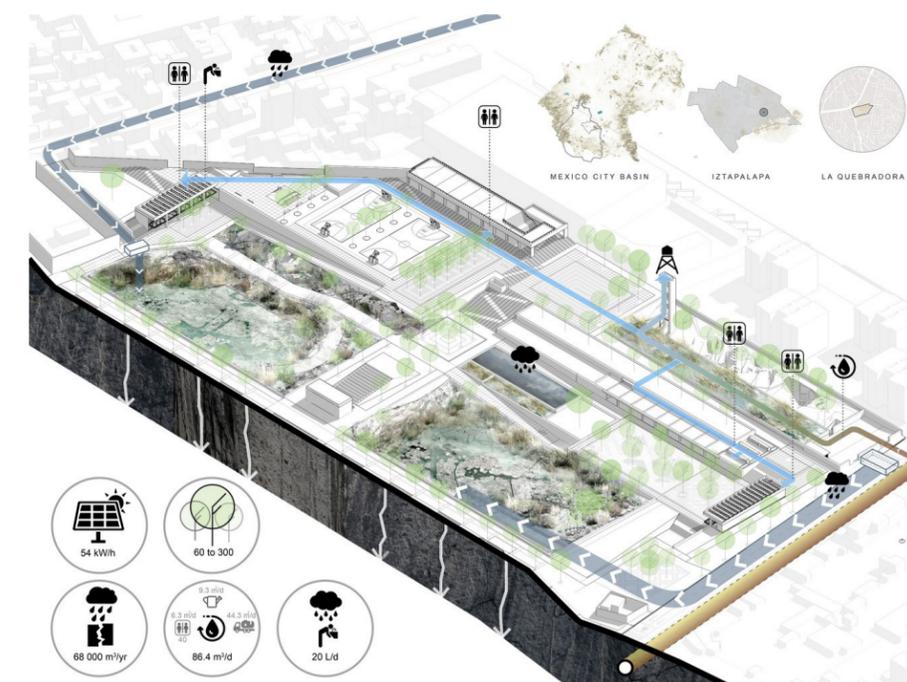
Hydropuncture's retention pond to alleviate flood damage
